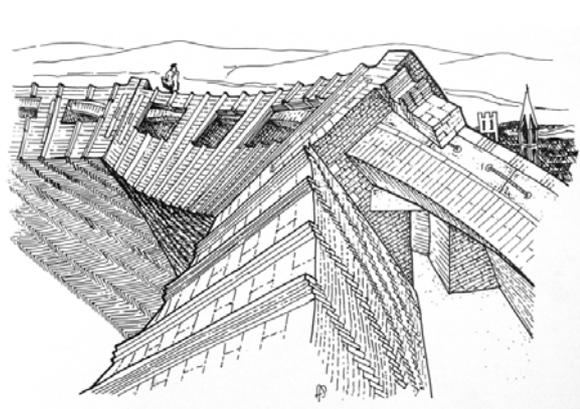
Duomo, Florence. General view and construction detail. Brunelleschi. (Gärtner; Mark)
